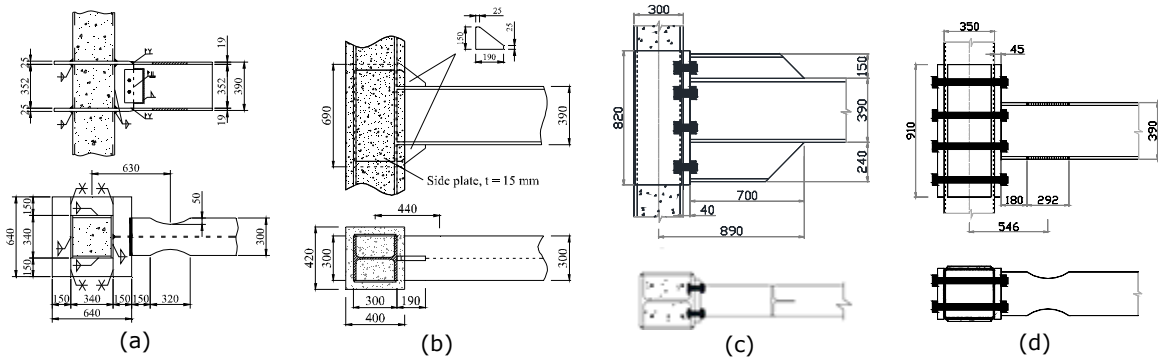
Figure XIV. Designed beam-to-column joints for the moment resisting bays: (a) ED-RBS – welded external diaphragm reduced beam section joint; (b) RS – welded rib stiffened joint; (c) HH – bolted hammer head joint; (d) LB-RBS – bolted reduced beam section joint with long bolts
